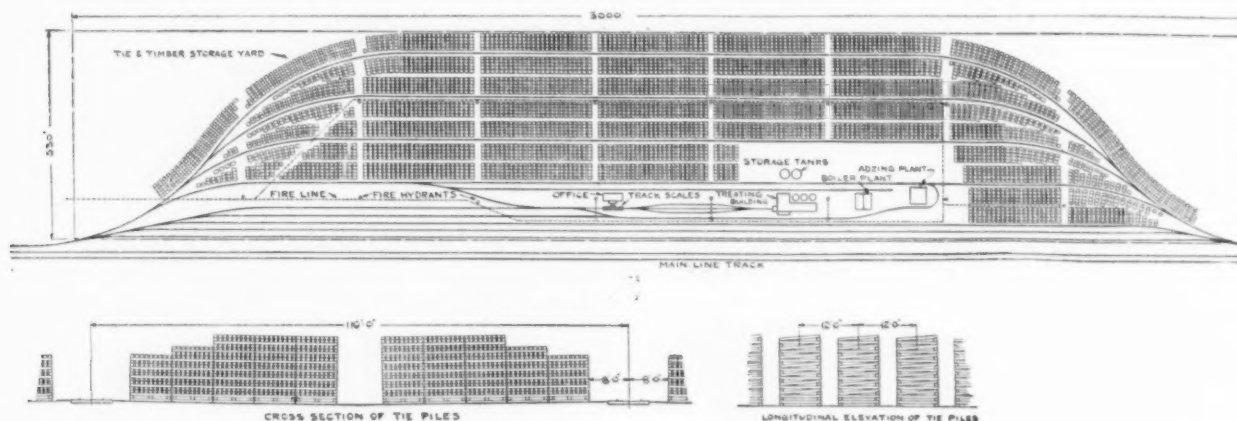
PLAN SHOWING LAYOUT OF ENTIRE PLANT
